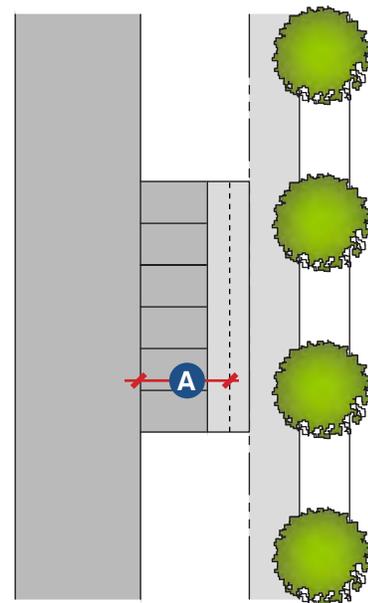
FIGURE: RESIDENTIAL GROUND FLOOR PATIO PLAN VIEW DIAGRAM
